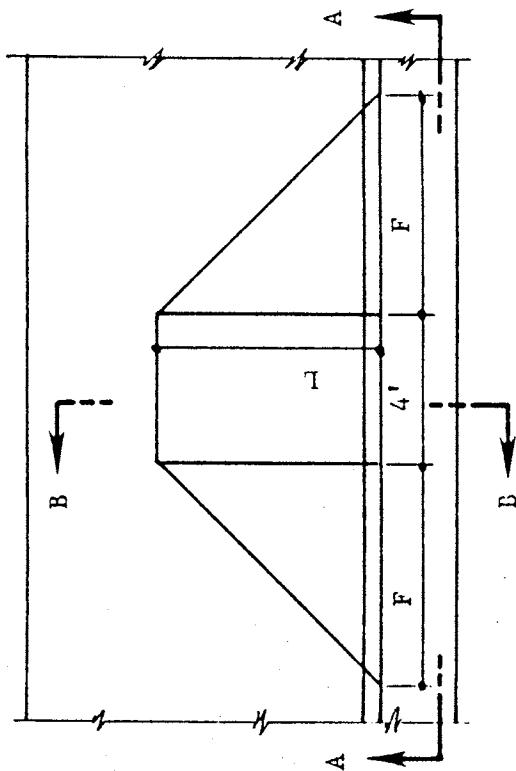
Standard design for sidewalk widths less than or equal to 8 feet.
